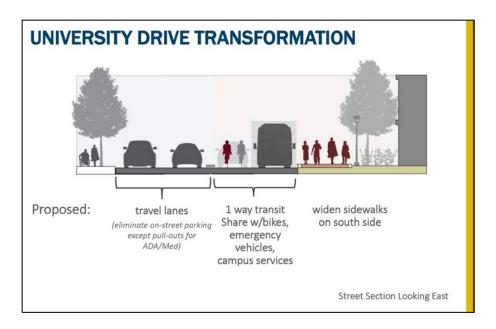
Draft 2040 Campus Master Plan Update Proposed Cross-Section
